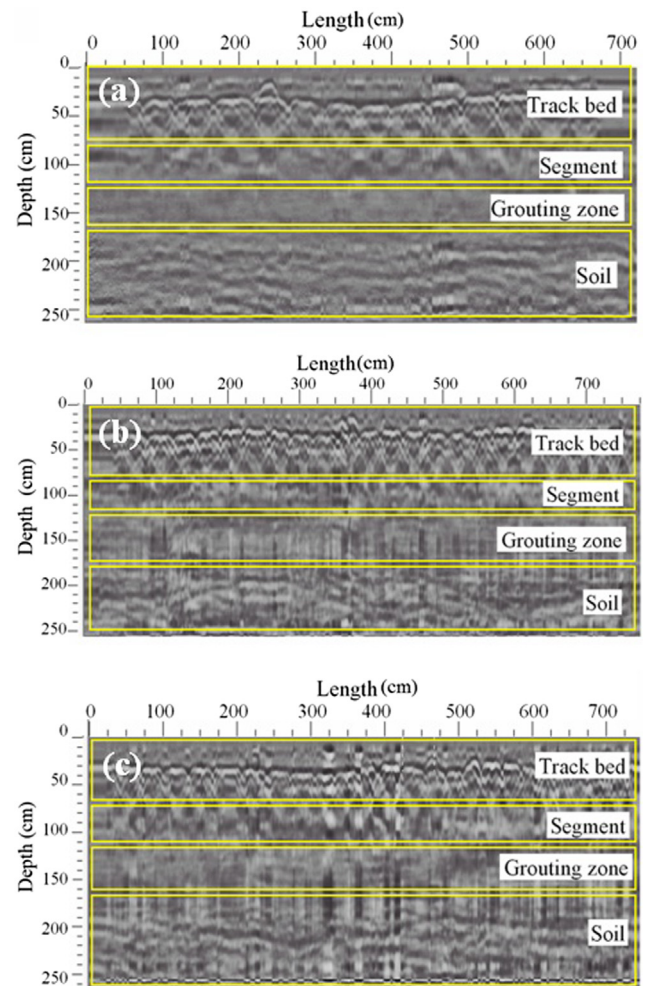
Interpretation of GPR scanning: (a) Typical section at the maximal uplift are, (b) Typical section at the maximal uplift slope area, (c) Typical section at the area without secondary grouting.
